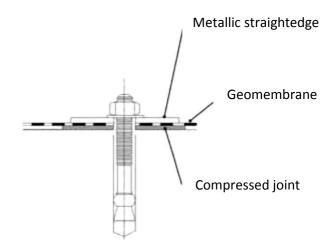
Section of mechanical fastener based on a metallic straightedge
